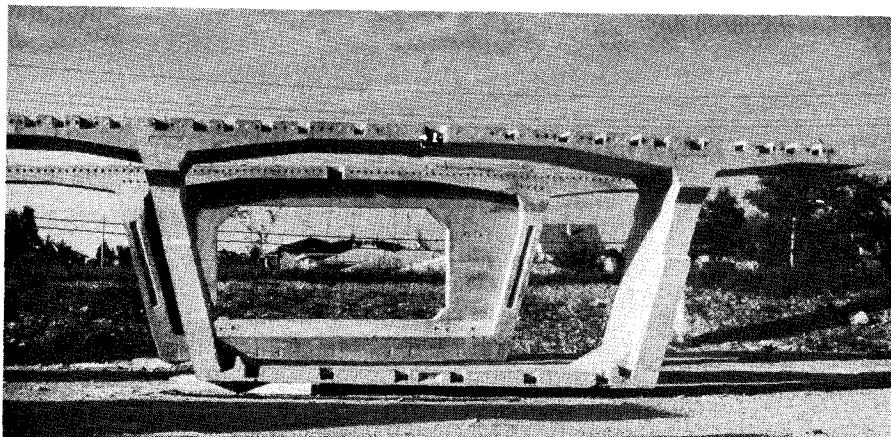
Precast segments for Kishwaukee River Bridge near Rockford, Illinois.
